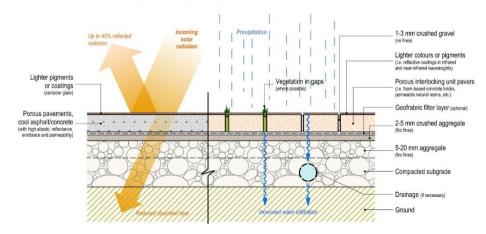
Examples and cross sections of cool and permeable pavements <sup>(8)</sup>.
